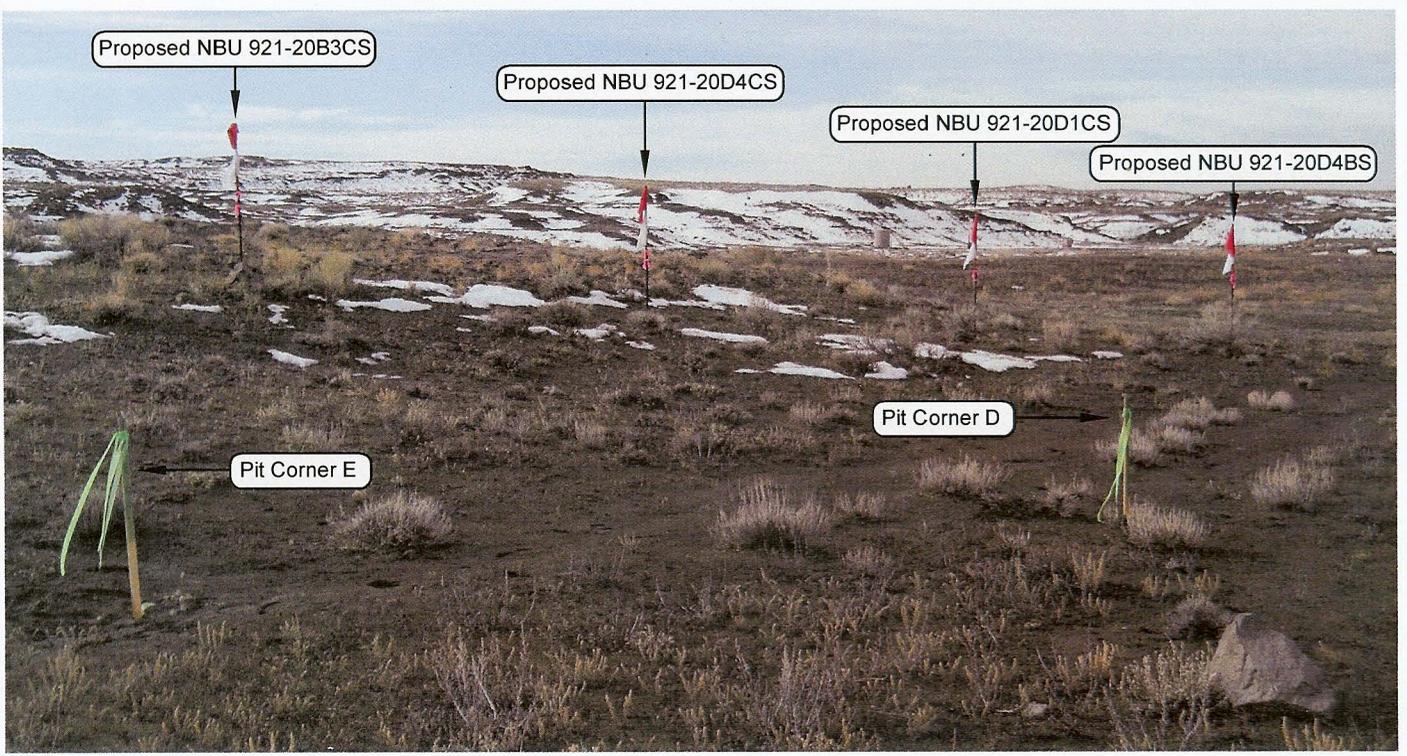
PHOTO VIEW: FROM PIT CORNER D TO LOCATION STAKES
